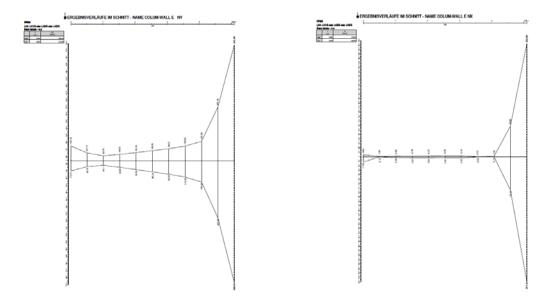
Design envelope for 'n-y' load vertically (left) and 'n-x' transversely (right) of the connecting surface between the (earthquake-resistant) shear wall –column
